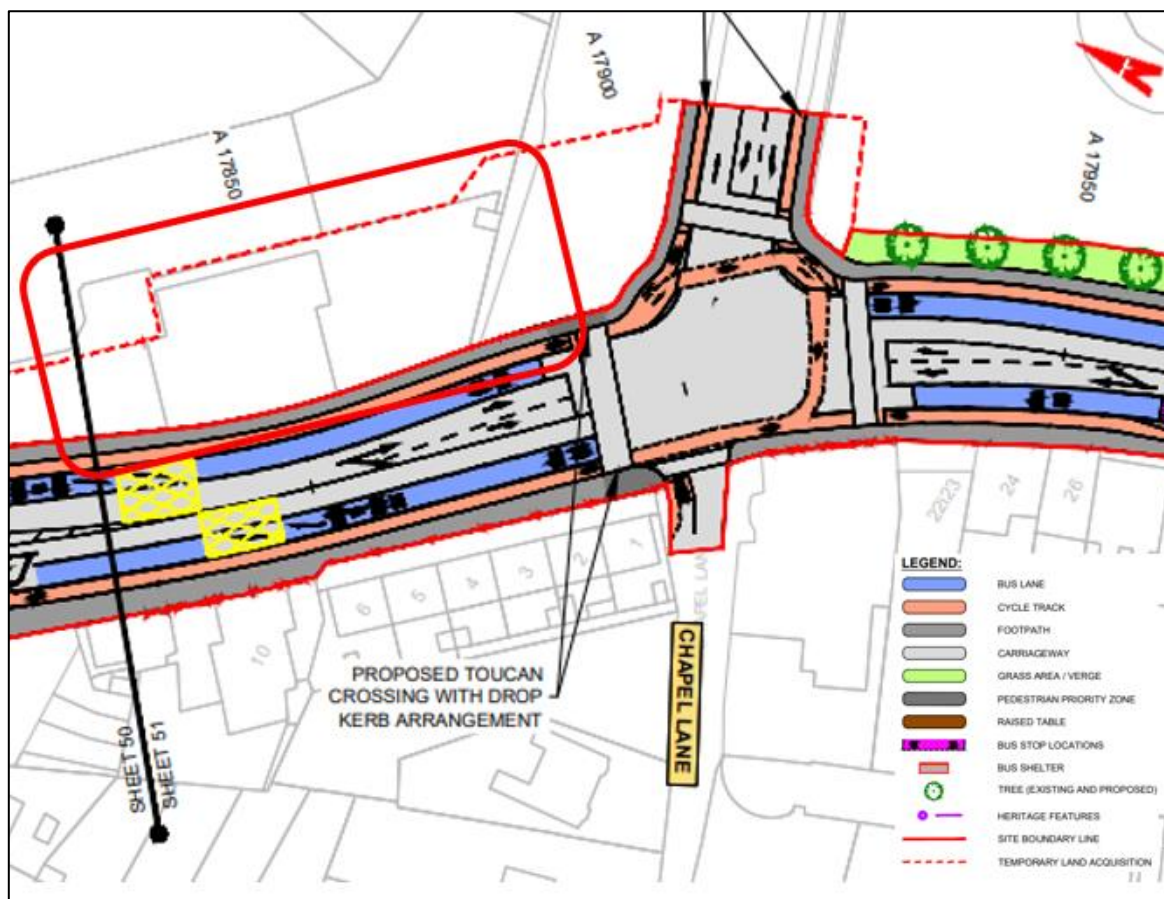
Extract from General Drawing Arrangement at Dublin Road (Sheet 51)
